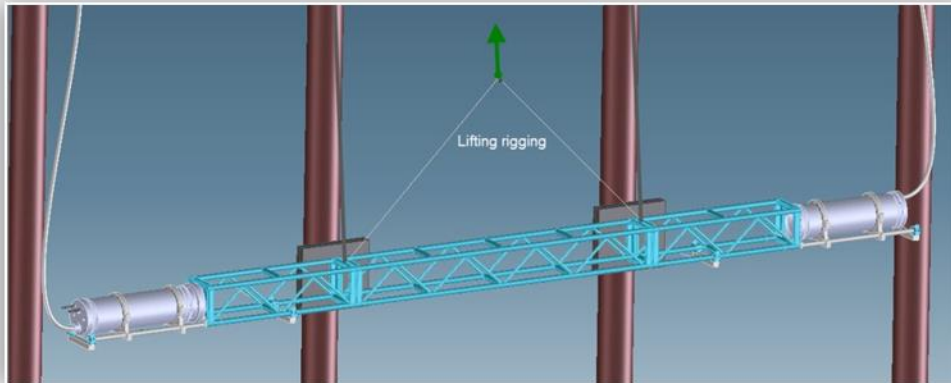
CAD drawing of truss assembly alongside pier pilings.
